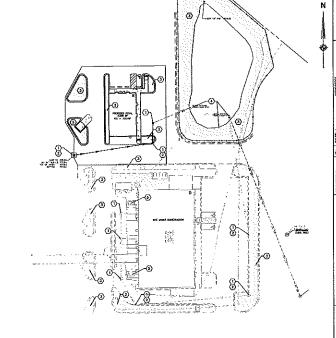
ELKHART MARKET CENTER - BUILDING D+E, SHEET 304
